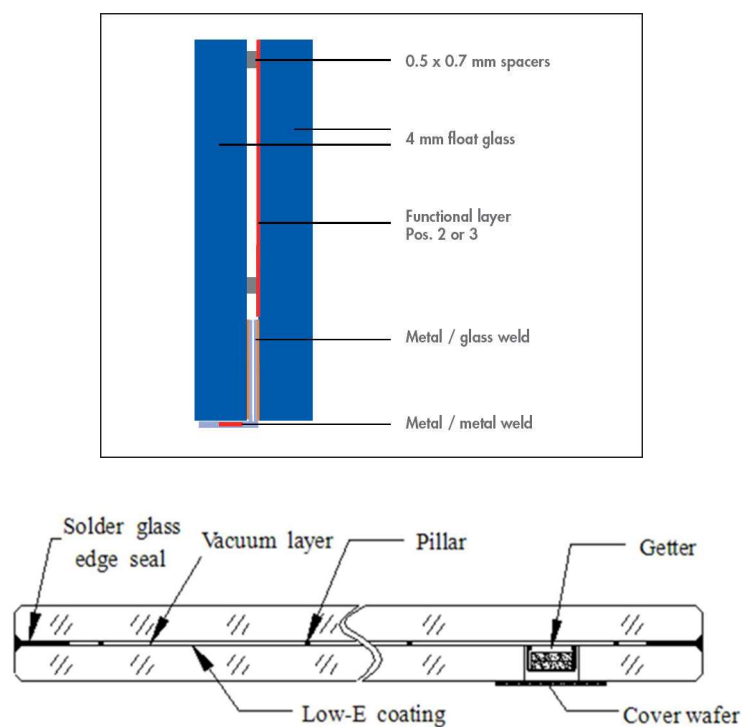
Vacuum glazing detail to be used in thermal bridge calculation (ZAE n.d.)
